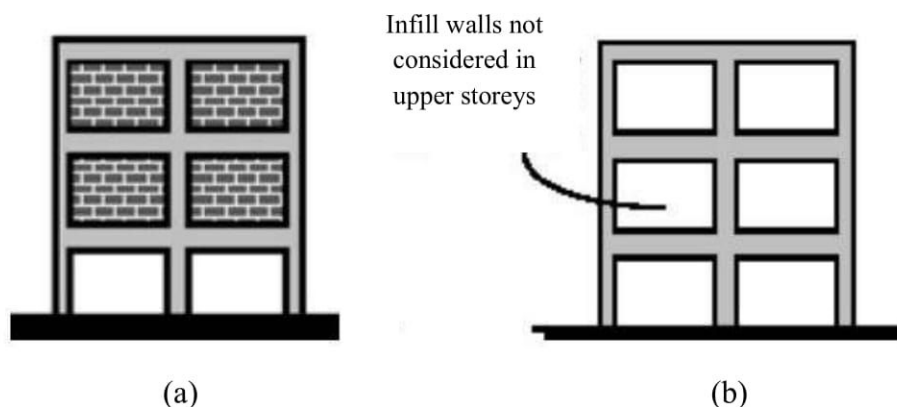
Open ground story building (a) actual building (b) building being assumed in current design practice (Haque, 2007)
